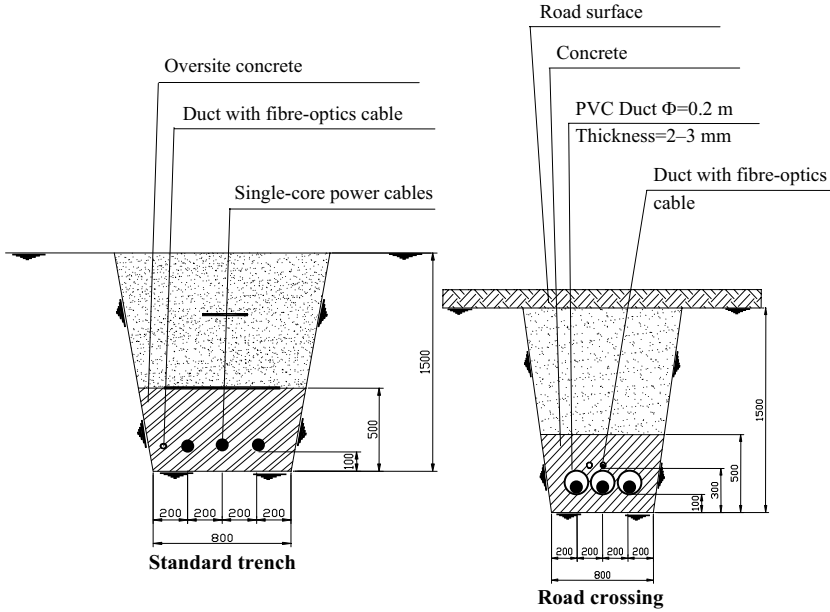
Installation details of land cable ($\phi = 83.9$ mm) laying (SAR.CO) (Courtesy of Terna)
